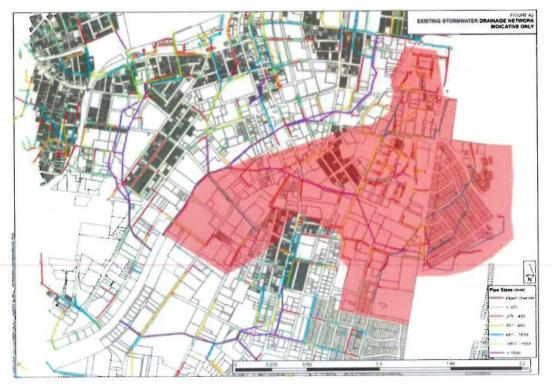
Green Square Trunk Drain Catchment (source Green Square Trunk drain – Hydraulic and Flood Modelling report)
